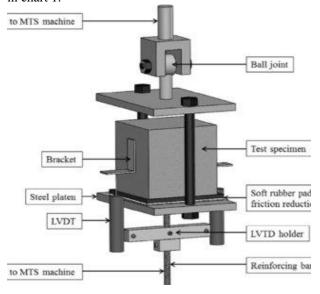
Pullout test specimen test specimen is arranged and care is taken such that test values should be more accurate.
